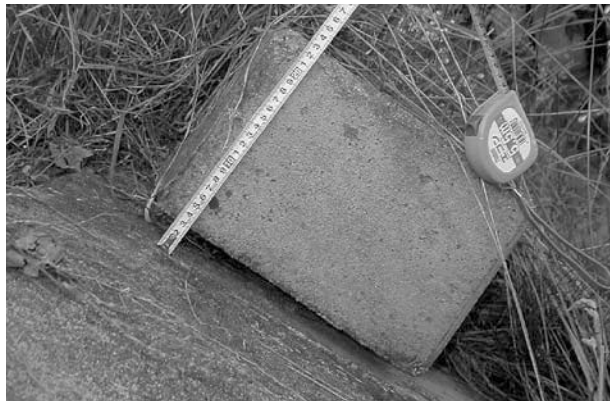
Lifting of concrete cover for subsidence of anchor supporting structure
